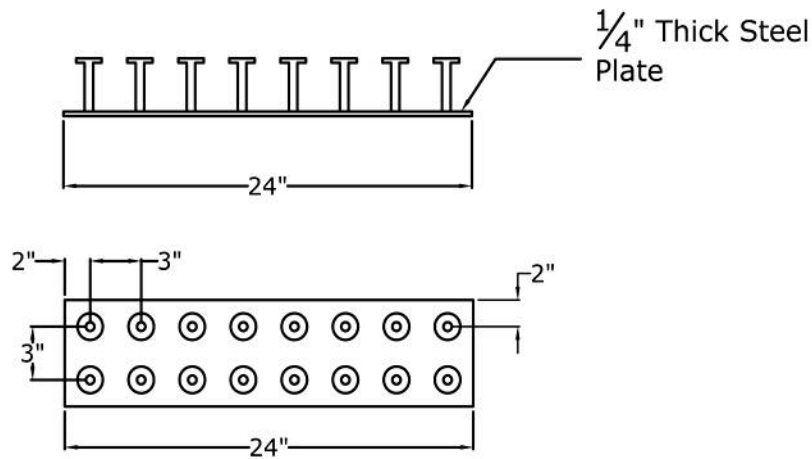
Dimension and shear stud details of the steel embedment plates.
